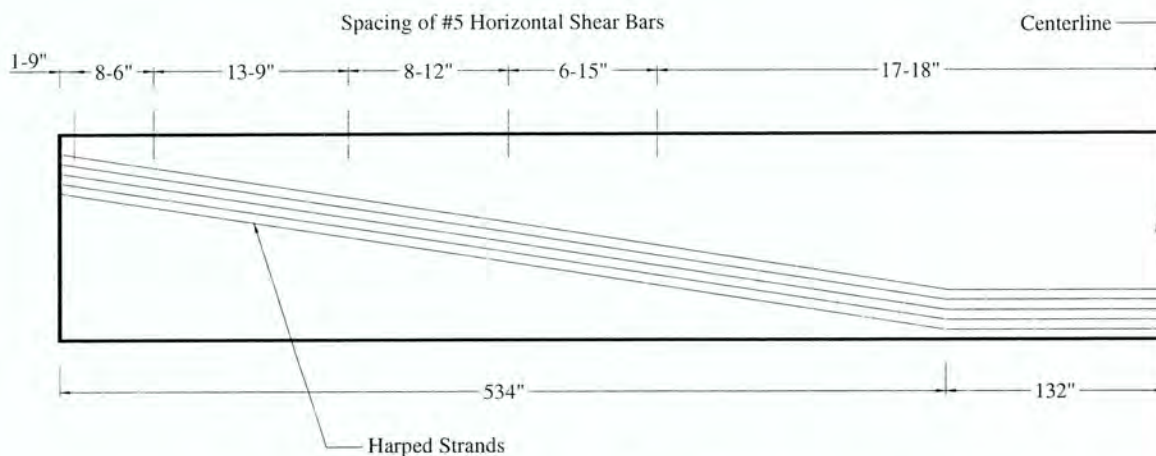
Elevation of Wapello County UHPC bridge beams.
